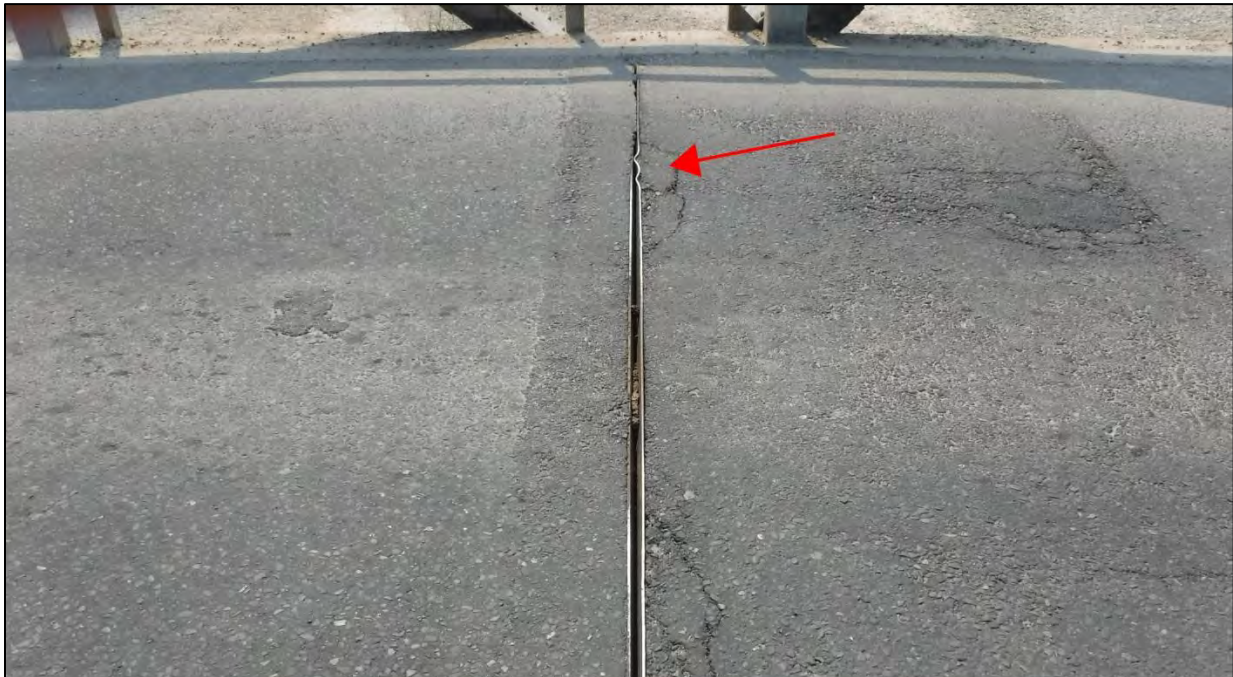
Joint 2 over Bent 2 with area of 3/4 in. bends in the steel plates
